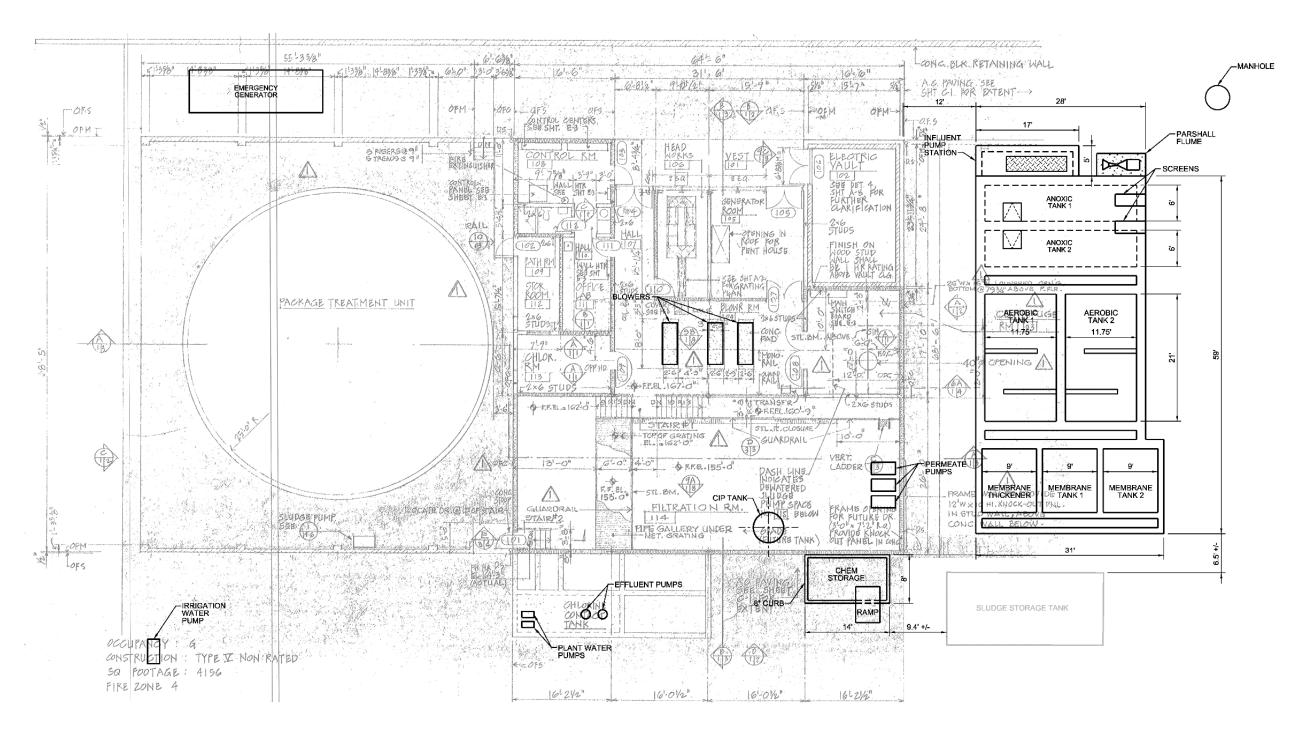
Preliminary Site Plan County of Los Angeles Public Works Malibu Mesa Water Reclamation Plant
